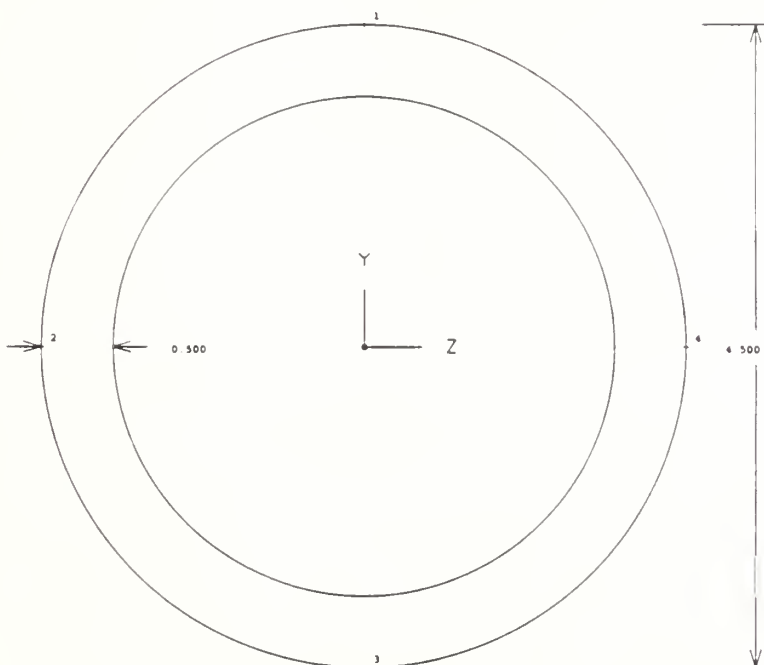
BEAM CROSS-SECTION (4.5 IN).
